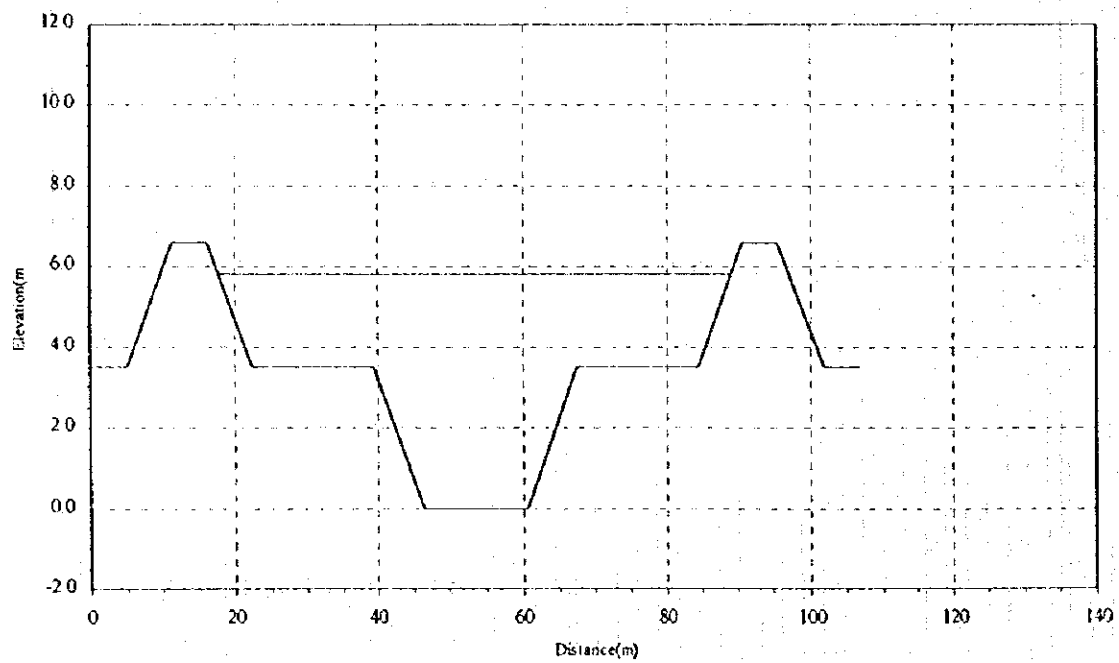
PROPOSED LONGITUDINAL PROFILE AND CROSS SECTION (2/13)
